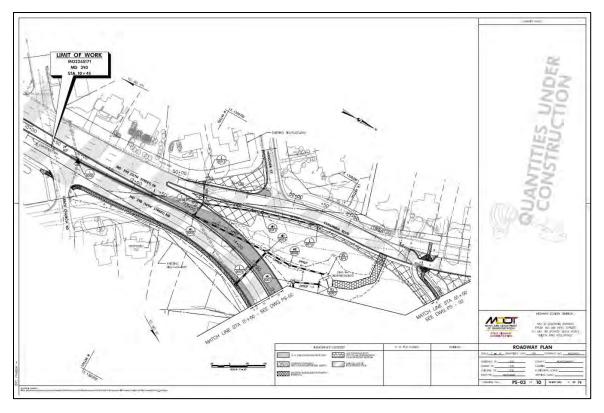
Plan View – 16<sup>th</sup> Street South to Grace Church Road
